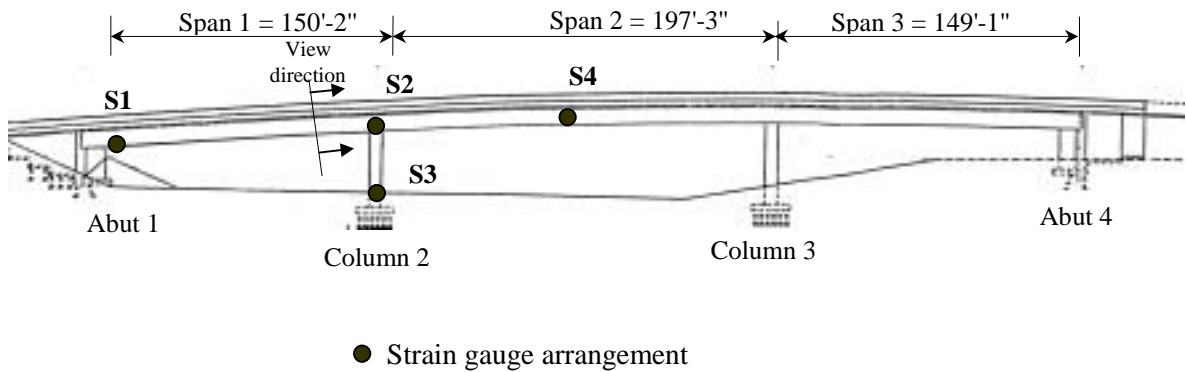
Strain Gauge Arrangement at West Street On-Ramp; Elevation
